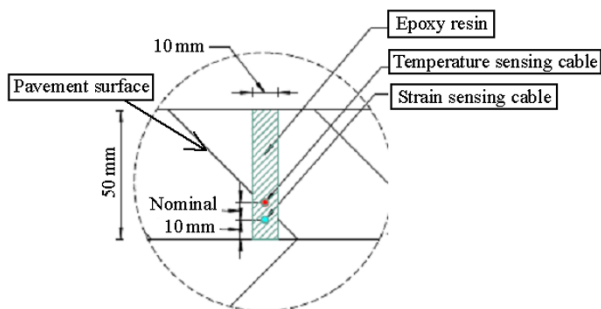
Strain and temperature sensing cables embedded in the asphaltic top layer of the pavement.
